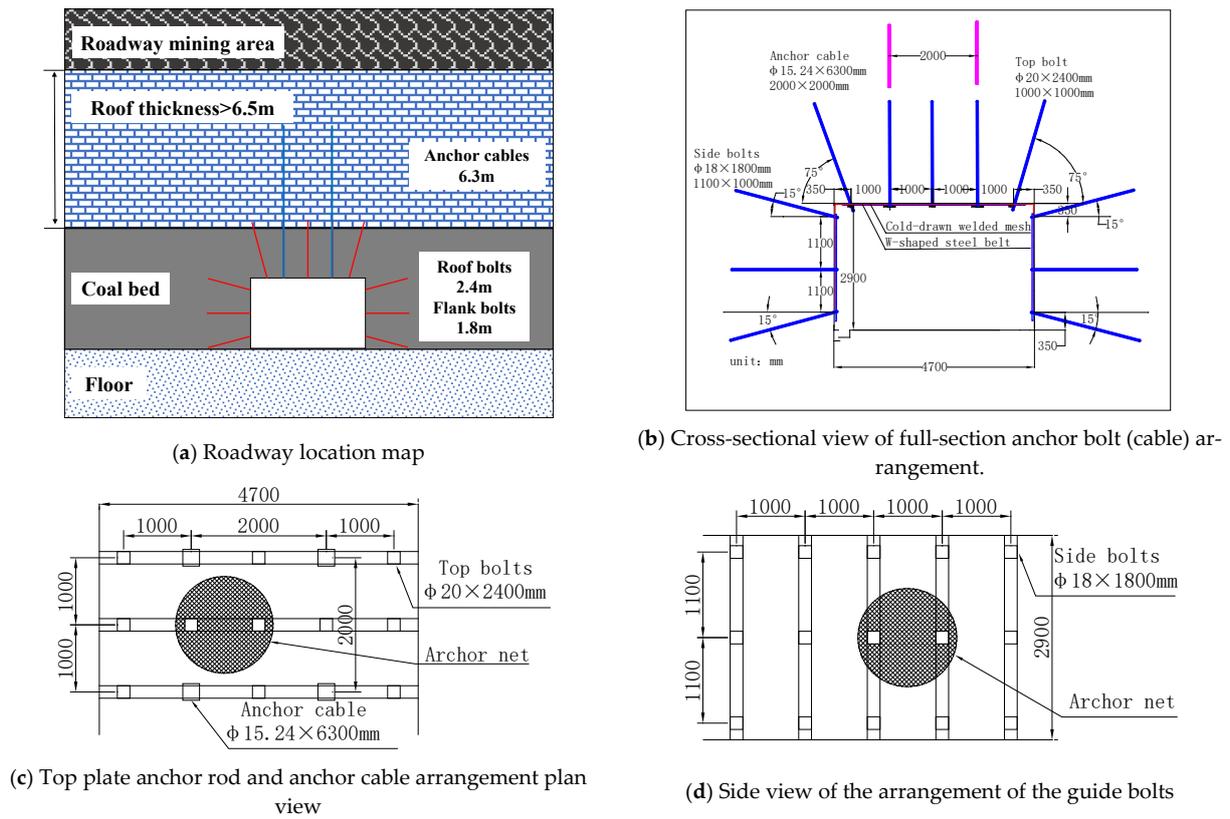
Support form for layer spacing greater than 6.5 m: (a–d).
